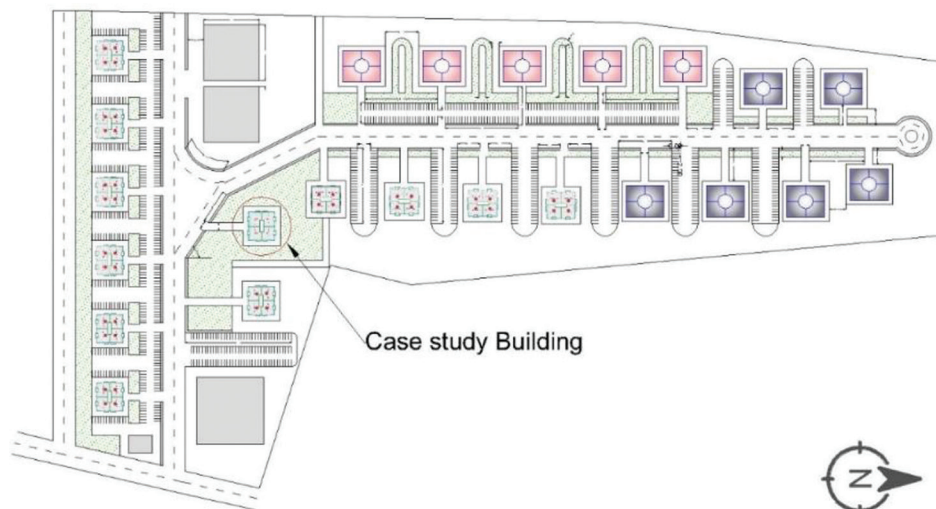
Darwaza city site plan and the studied building located on it (Source: Author).
